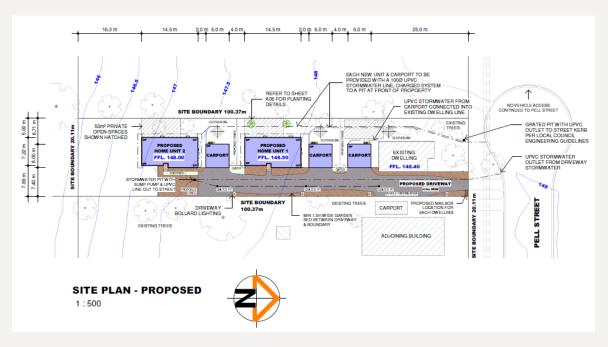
| Proposed Site Plan (Source: Rob Pickett Design)
